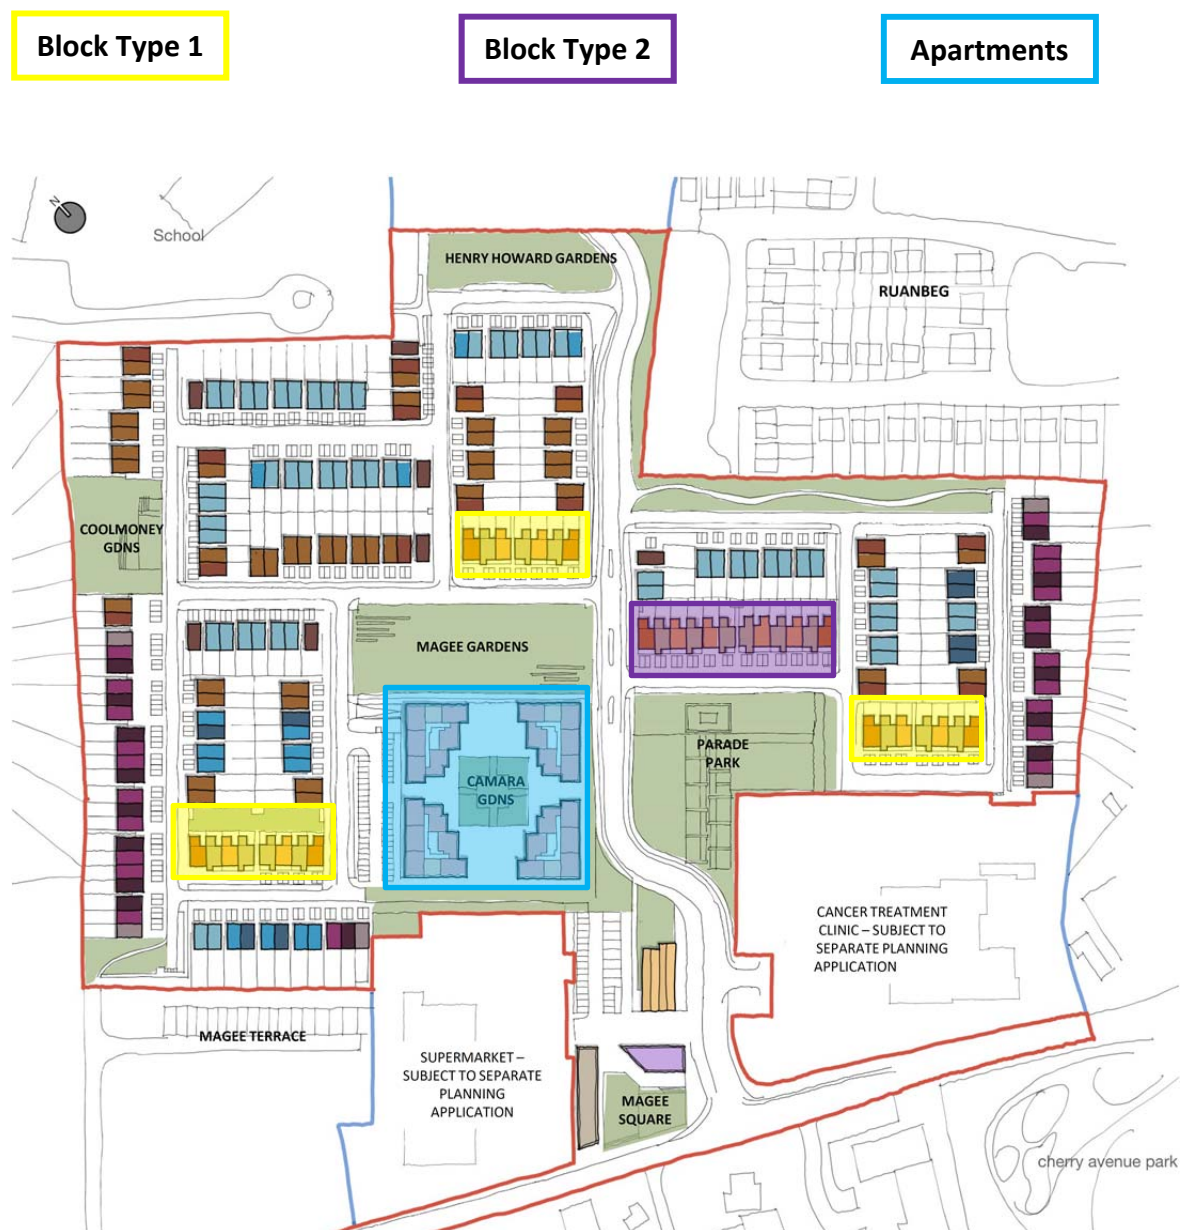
Duplex, 1-bed Apartment units and Apartment Blocks layout - Phase 1
